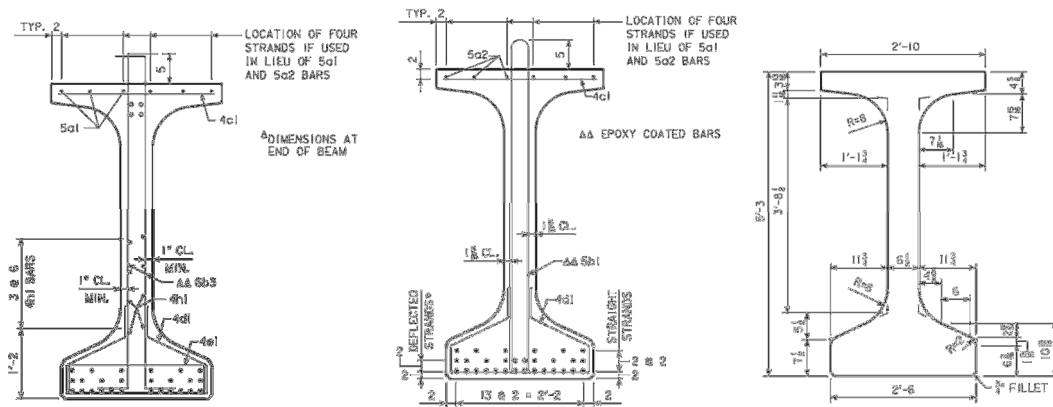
Cross section of the end span, the mid-span and the gross cross section of BTE 110 girder
